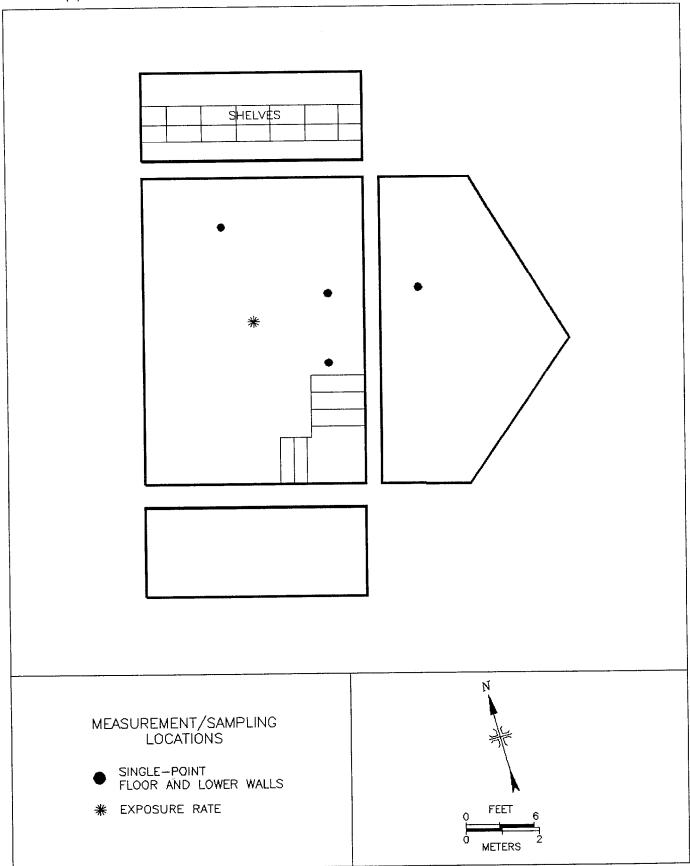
South Building, Area 5, East Mezzanine (Loft) — Measurement and Sampling Locations
